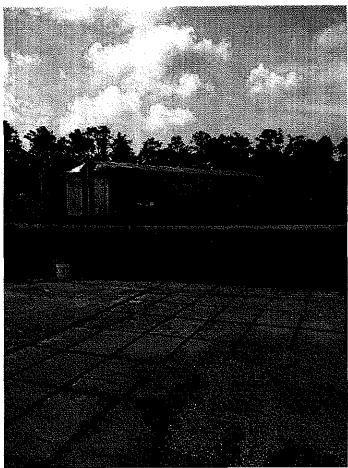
View of maintenance shop and equipment on OU2. (June 3, 2010)
